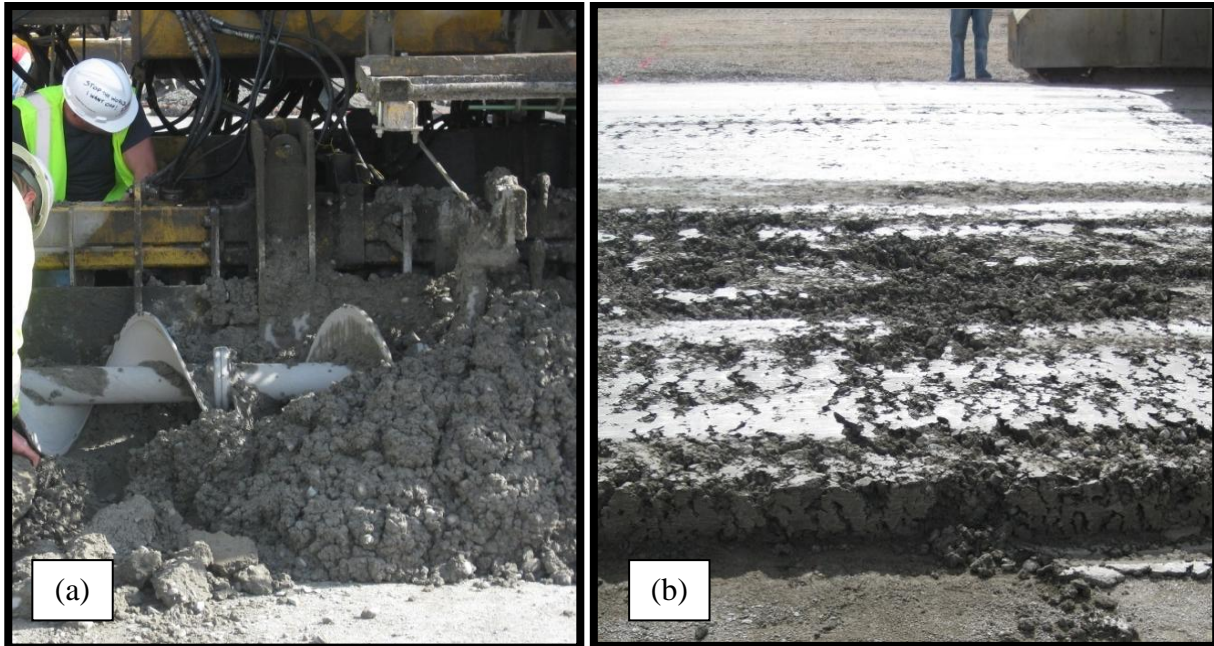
(a) Demo Slab Construction and (b) Demo Slab Bottom Lift
